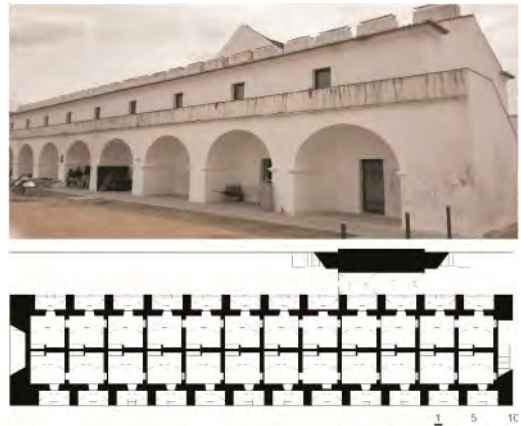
Barracks in Moura – side view and ground floor plan Source: Rosado et al. 2019.
